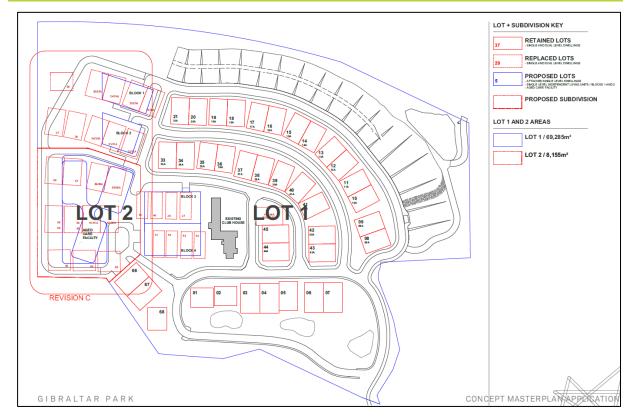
Stage 2 Concept Master Plan showing proposed 8,630 square metre lot to be excised.
